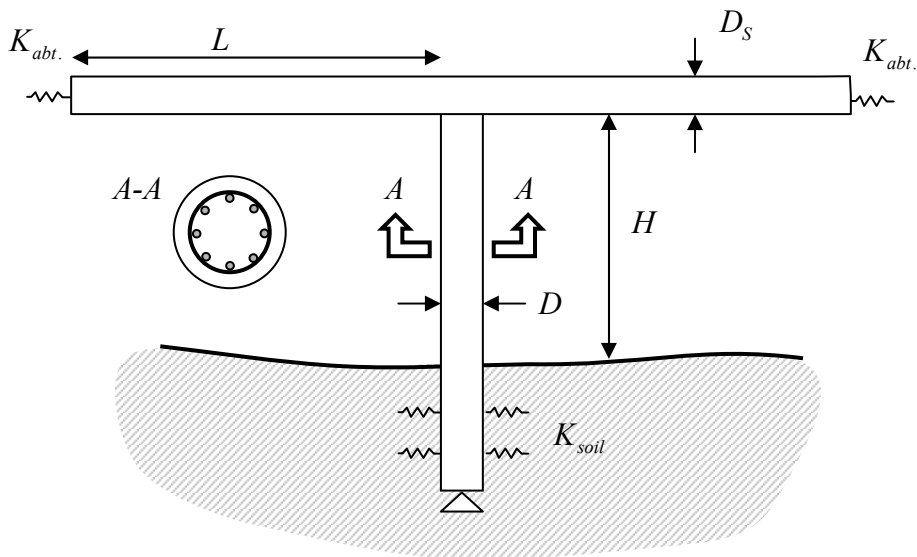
Design parameters for the example single-bent overpass bridge (not to scale).
